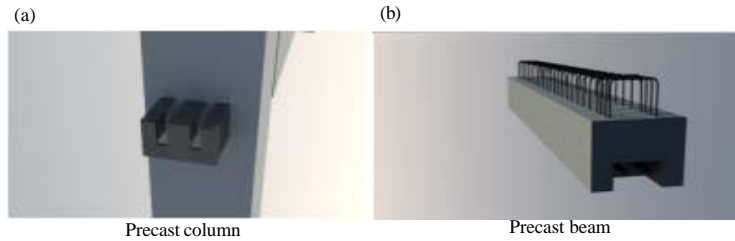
a, b) Connection schema of first Precast Connection (specimen PC-1)
